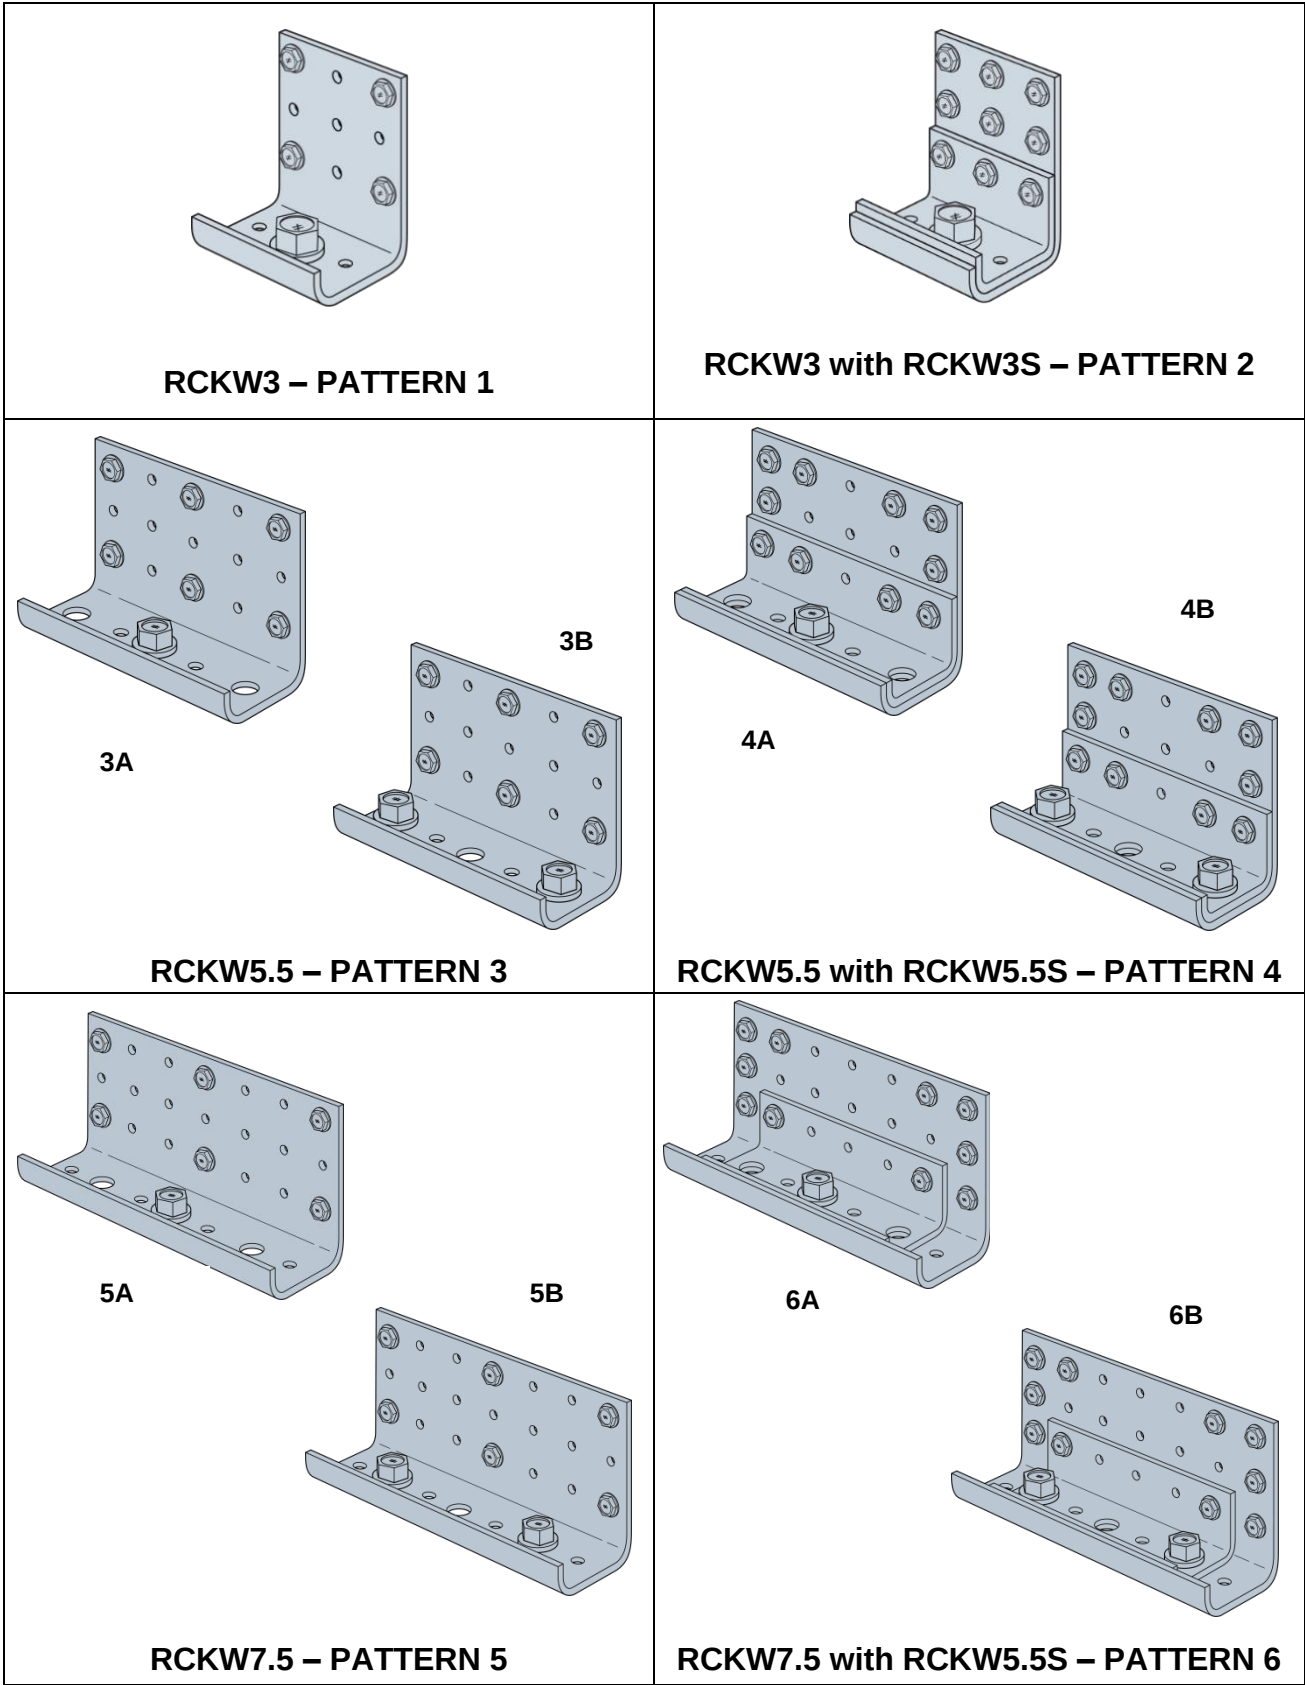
RCKW SERIES KNEE WALL CONNECTORS INSTALLATION DETAILS (continued)
